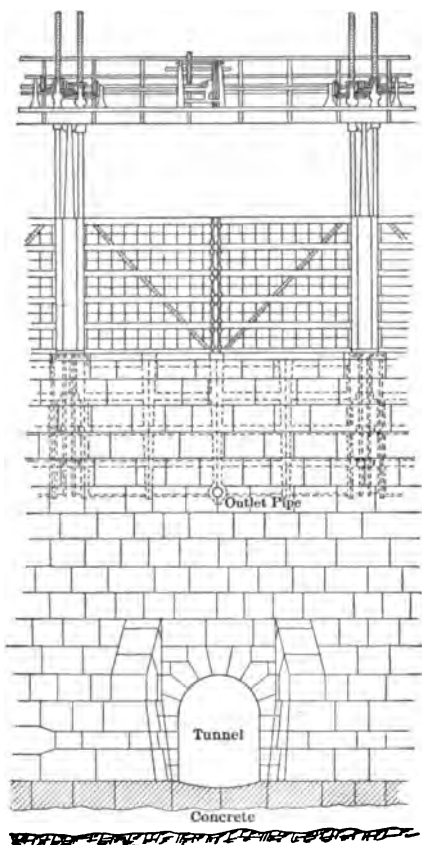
Down-stream Elevation, Goulburn Weir, Australia.
